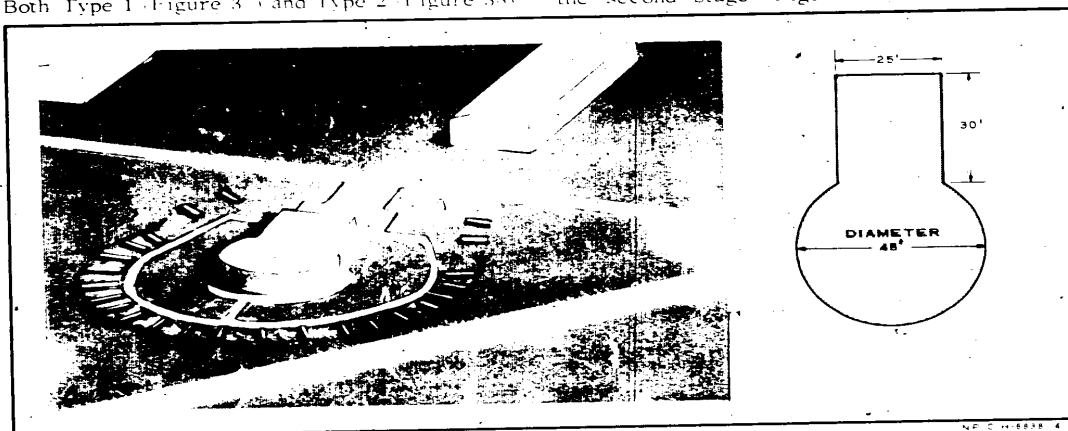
PLAN AND PERSPECTIVE VIEWS OF FUEL STORAGE, BLENDING, AND CONTROL STATION, TYPE I, SHEN-YANG AIRCRAFT ENGINE PLANT.
